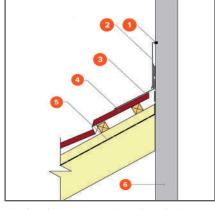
The adjoining of roof pitch to the wall sideways on the slope
